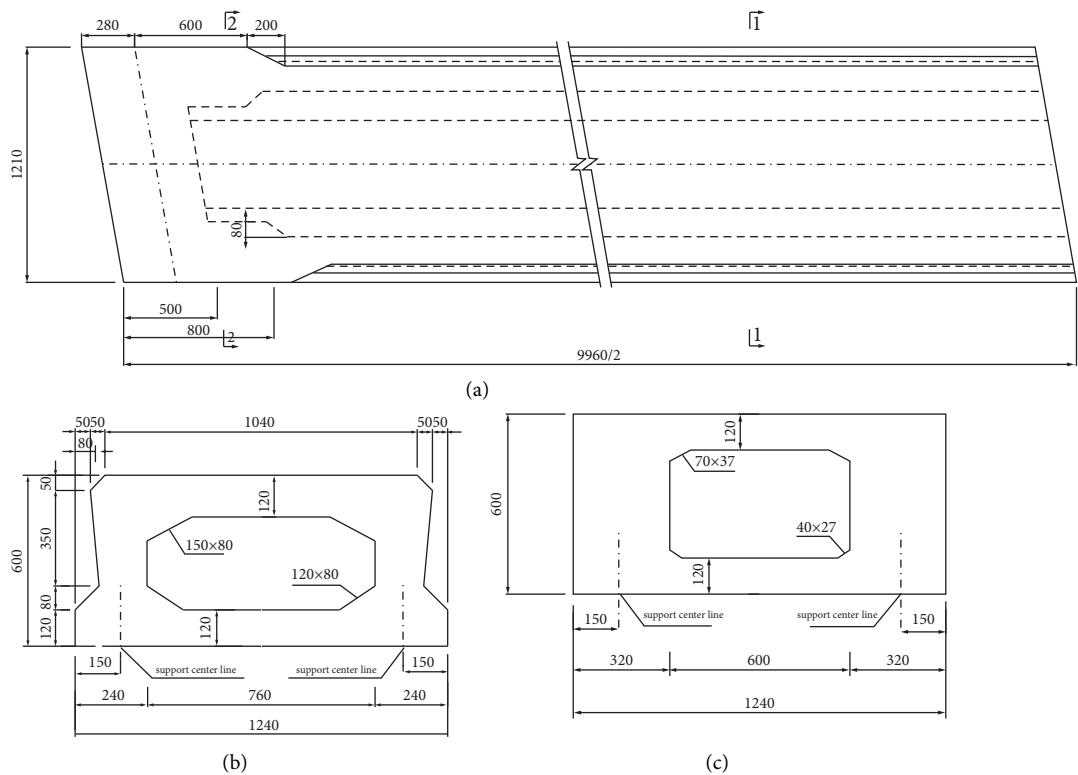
Structural drawing of the hollow slab beam. (a) Plan view. (b) Section 1-1. (c) Section 2-2.
